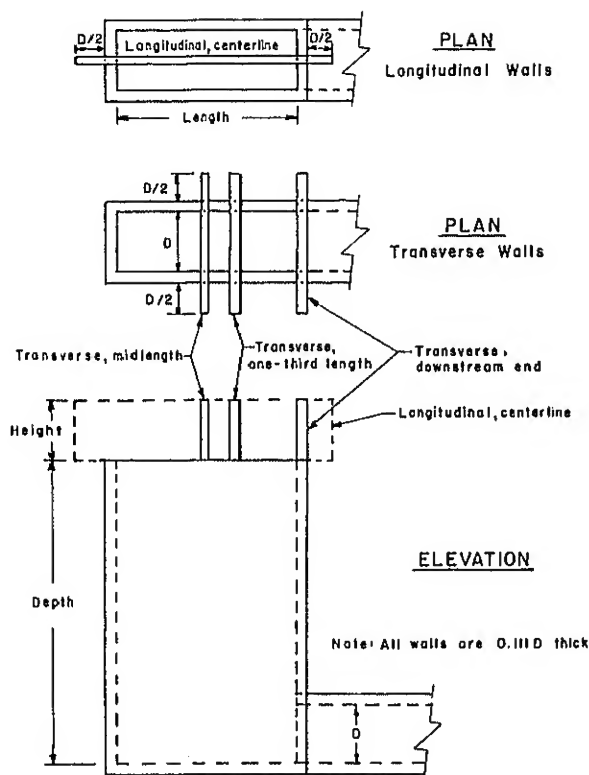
Test locations of antivortex walls on rectangular drop inlet.
